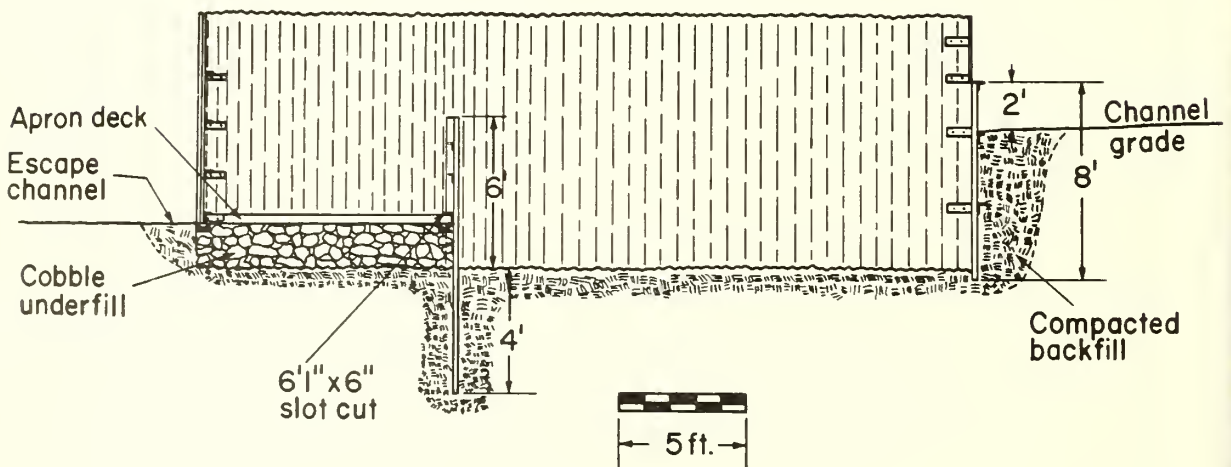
Section A-A: elevation view at centerline of the enclosed weir.
